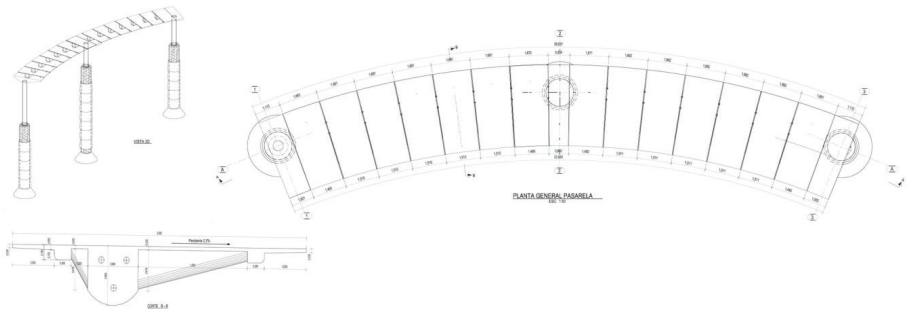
Cross-section and the structural conception of the UNAL pedestrian bridge.
